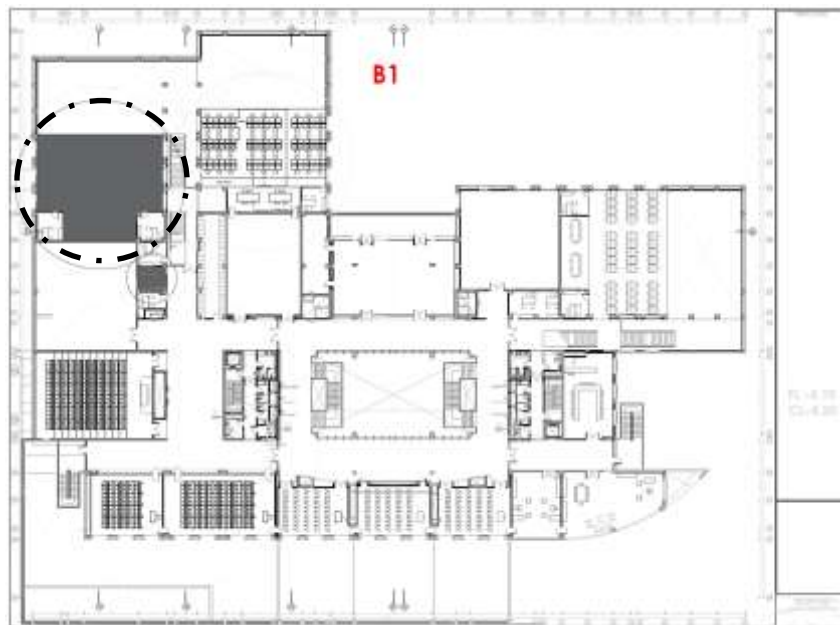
A4 Building - BAU – Studio 4 & office - B1
